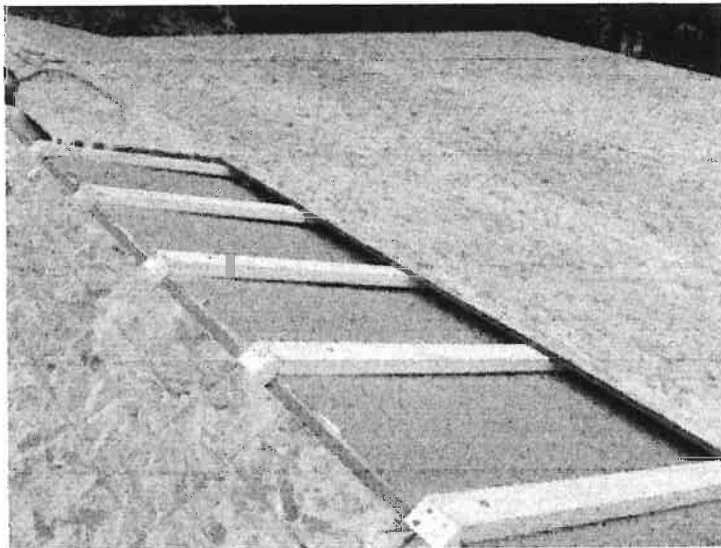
The roof sheathing is fastened to the 2x4 spacers, creating a 1½-inch vent channel above the rigid foam insulation (left). The sheathing stops short of the peak to allow airflow through the ridge vent (above).
